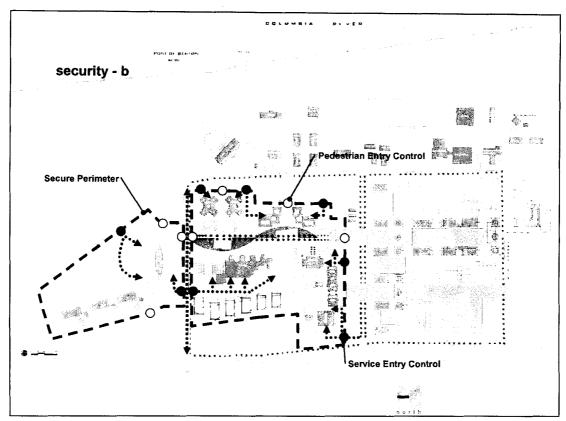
b Site security perimeter with Horn Rapids Road remaining open
